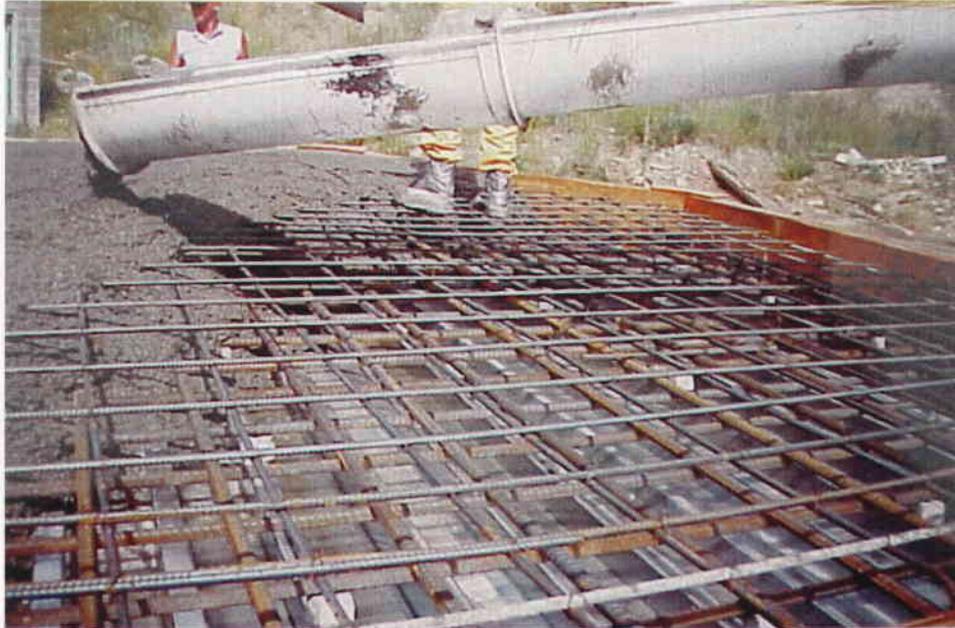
Typical cap rebar . The second cut would be through the center of the cap, removing a concrete and rebar plug 24 inches in diameter, and a nominal 18 inches thick.
